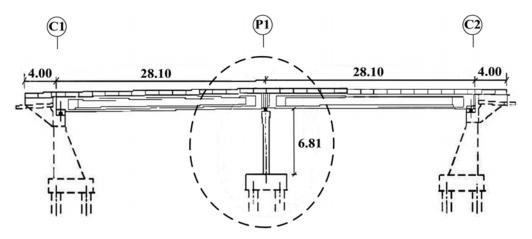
Elevation of a sample bridge 2 with a wall pier type
